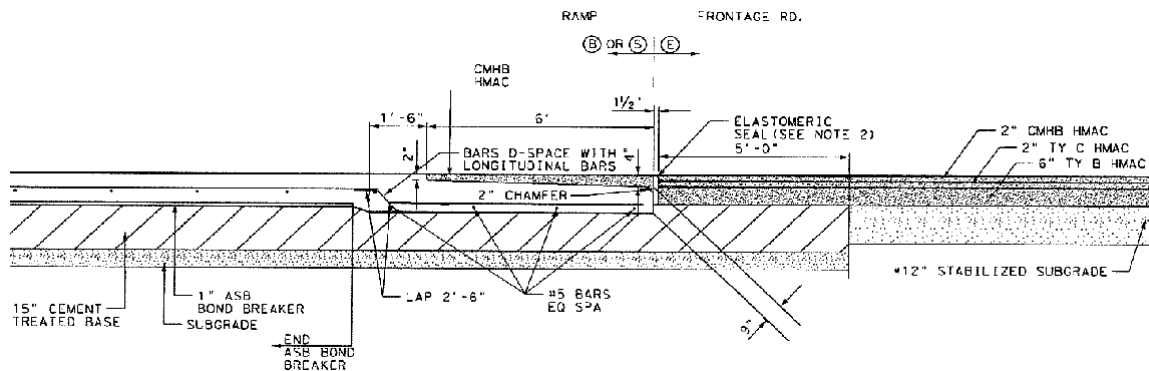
Section view of a typical joint between concrete and asphalt pavements (Source: Zollinger and Tayabji, 2007)
